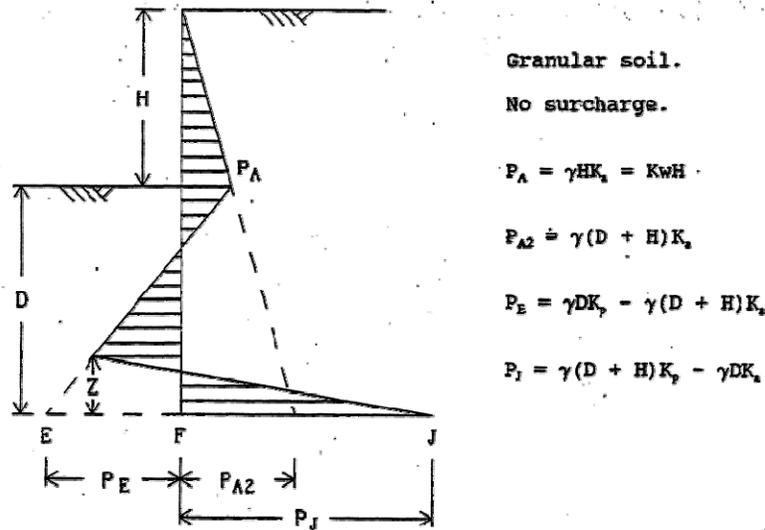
Cantilever pile loading, basis for driven pile and drilled shaft design, from California Trenching and Shoring Manual [25].
